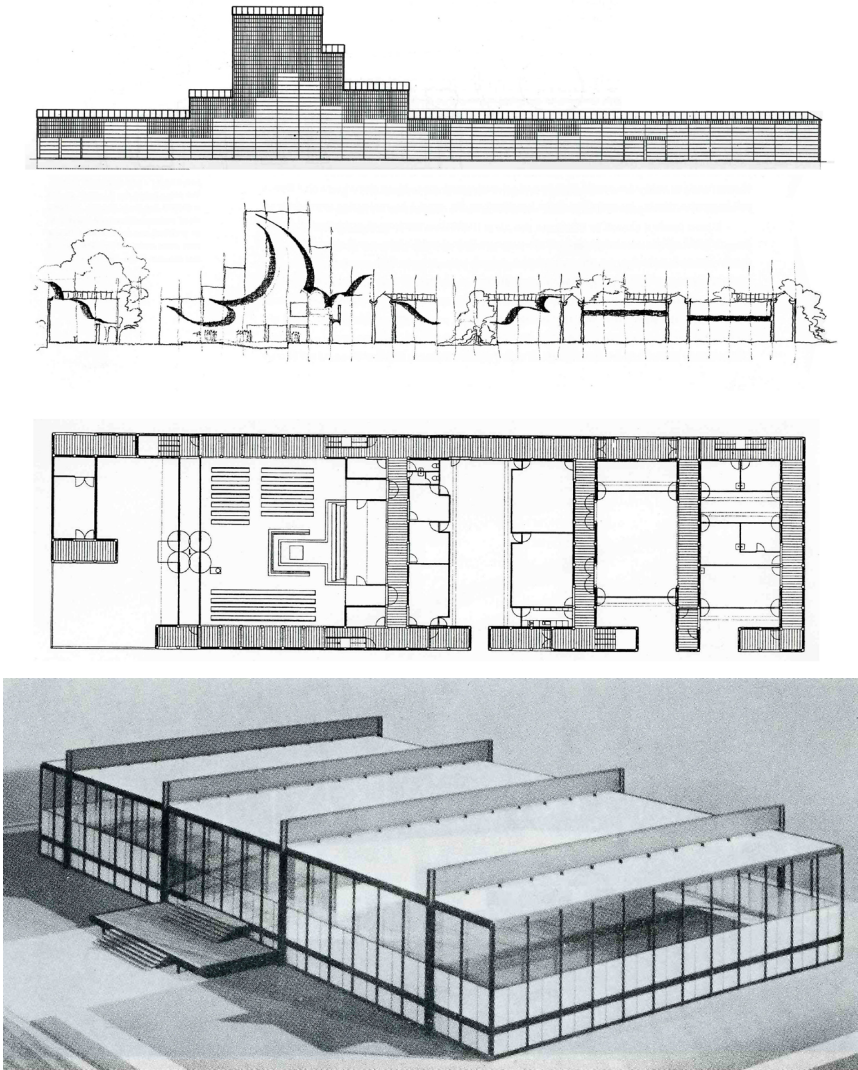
Plant, section and façade of the Bagsvaerd church, 1968. 'Jørn Utzon'.
